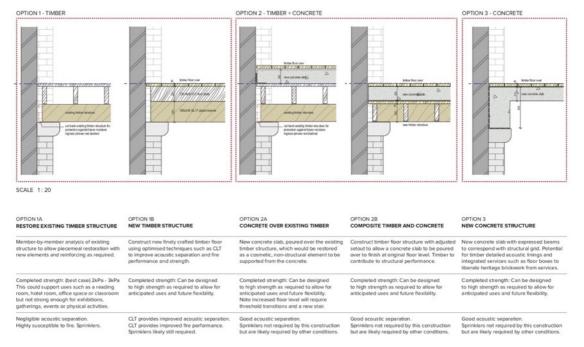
Proposed structural floor options, NTS. Archer Office
